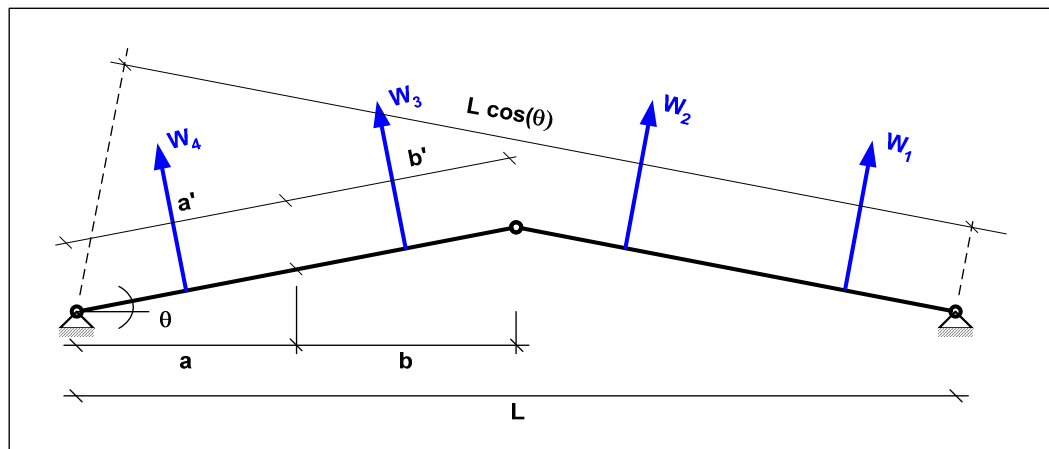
Structural model used for obtaining roof-to-wall load
